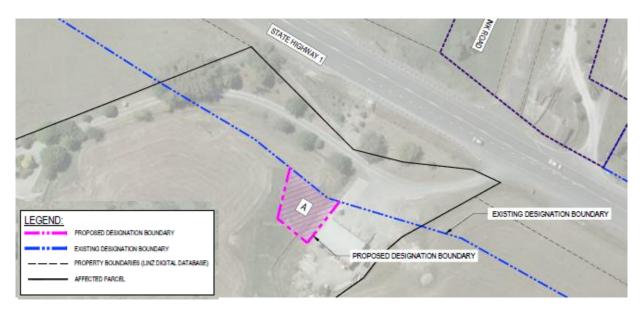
Snip of updated land requirement plan showing the updated designation boundary (full plan provided in Appendix A).
